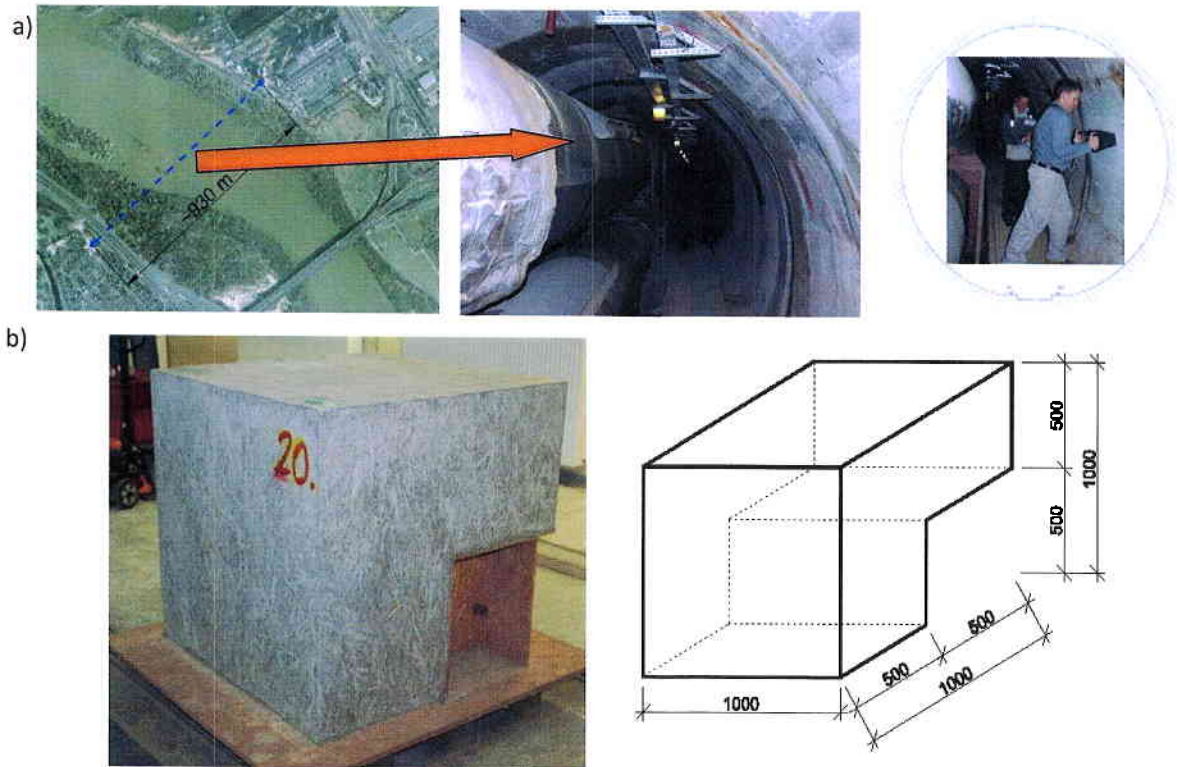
Illustration of geometrical imperfection – incorrect thickness of structure: a) concrete tunnel under Vistula and its cross-sectional view b) view and schematic of tested component.
